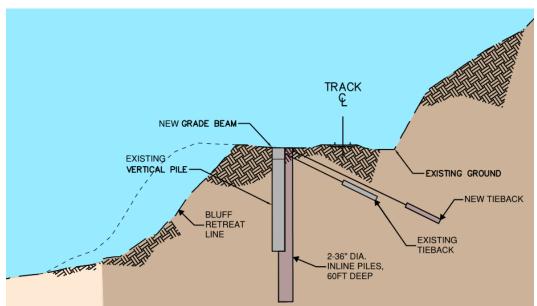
Typical Section of Inline Piles - Trackbed Support Retrofit Areas
